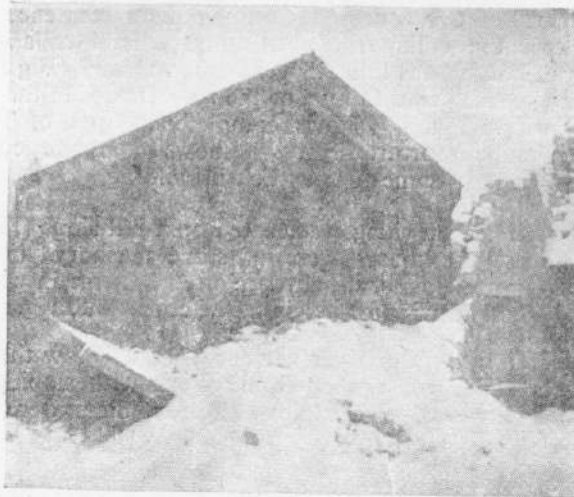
Collapse of gable end wall in dispensary at Chango village. Collapse of interior walls and fall of plaster is also seen.
